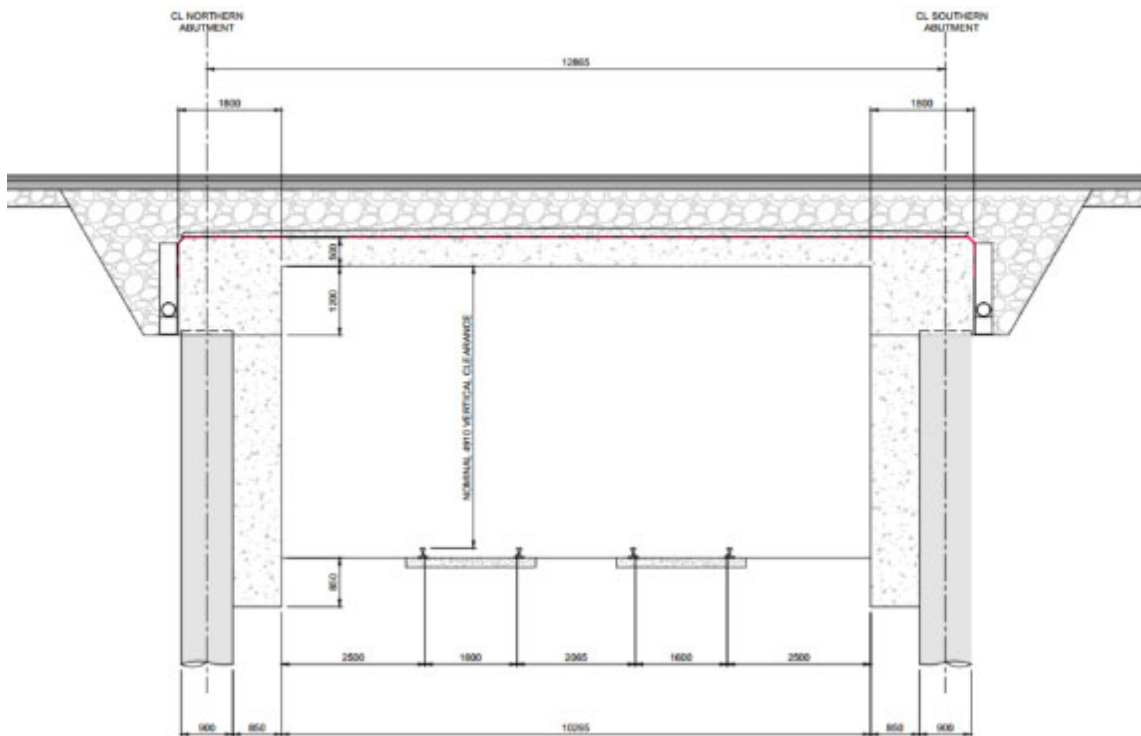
New South Circular Road Bridge (OBC1A) Typical Cross Section
